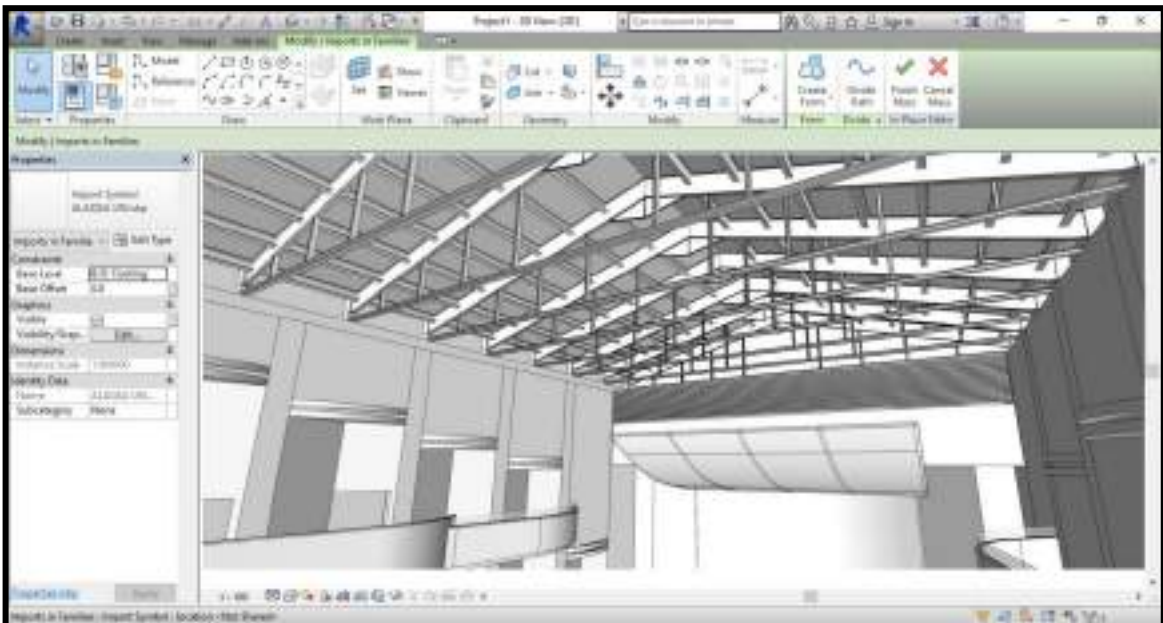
Galvanized Steel Sheets installed on the Cross Beams
